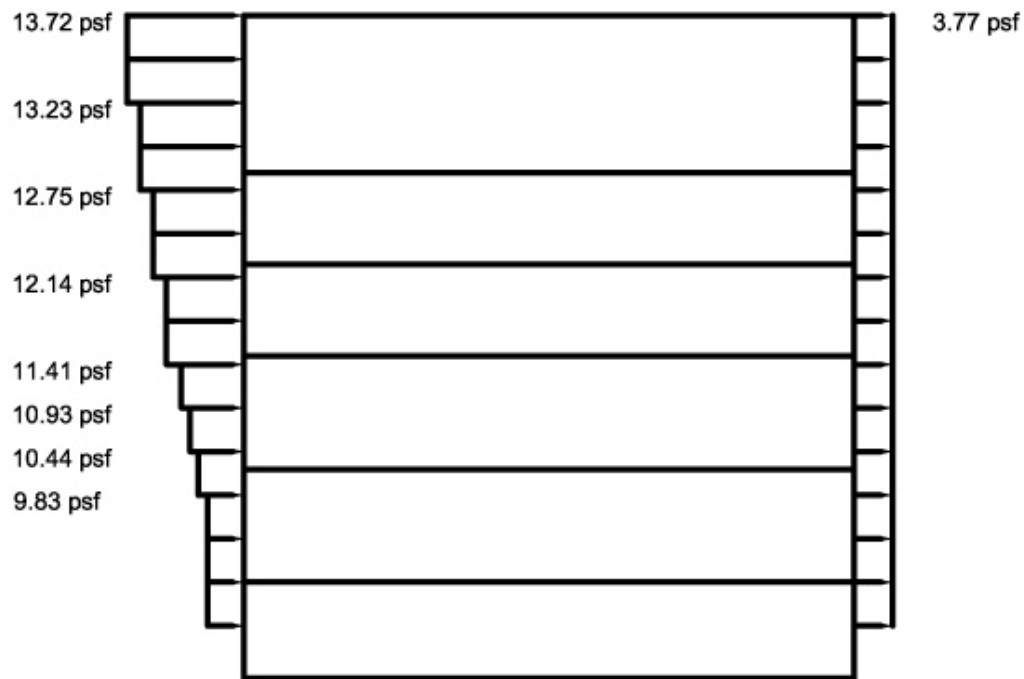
South Building Wind Pressure Diagram in the E-W Direction
